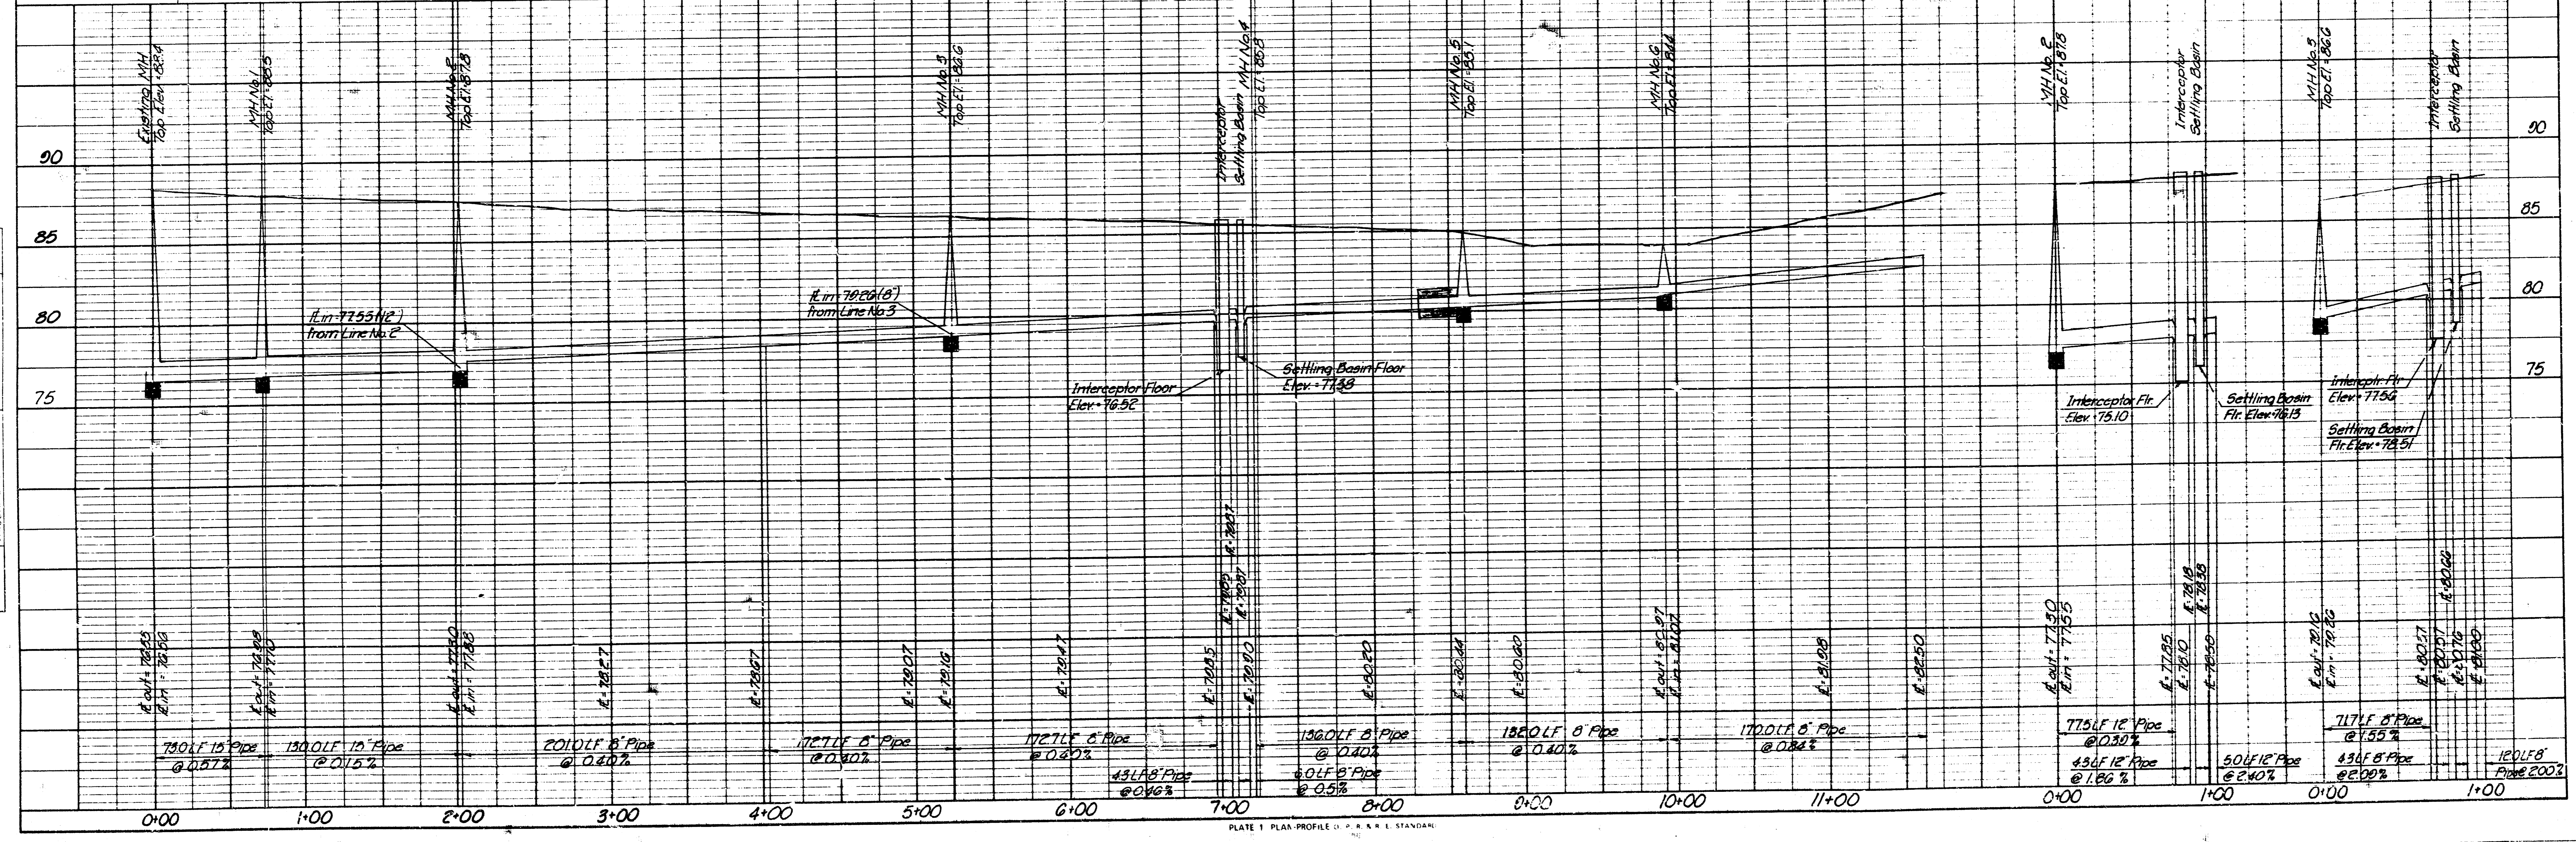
PLAN PROFILE (1" = 50' PLAN, 1" = 5' PROFILE)
